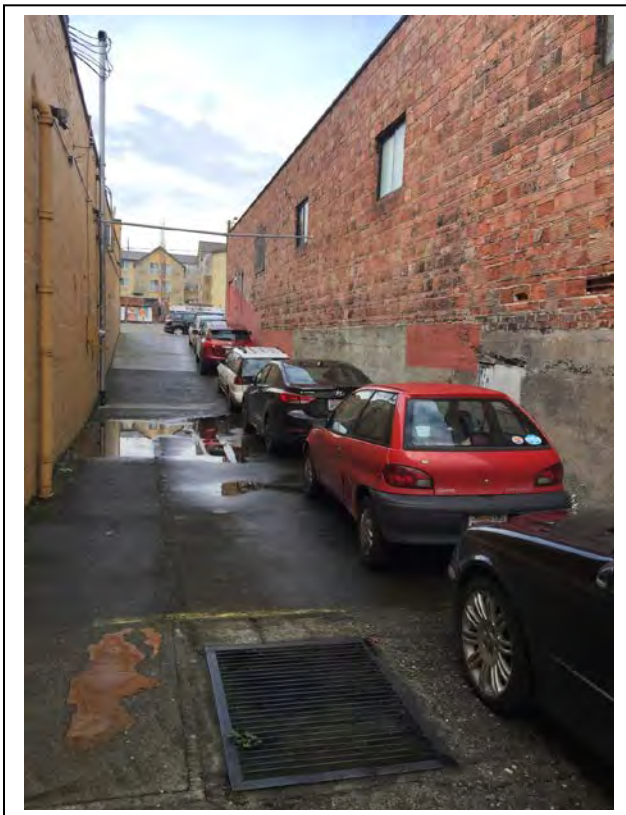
615 Dexter Avenue North, Seattle, Washington – The alleyway south of the building has a large drain. Documentation shows multiple underground storage tanks may exist in the alley.
